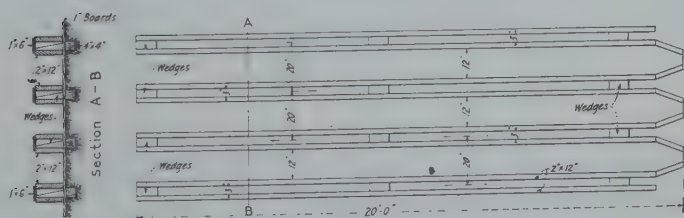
ARRANGEMENT OF FORMS FOR CASTING CONCRETE PILES.
